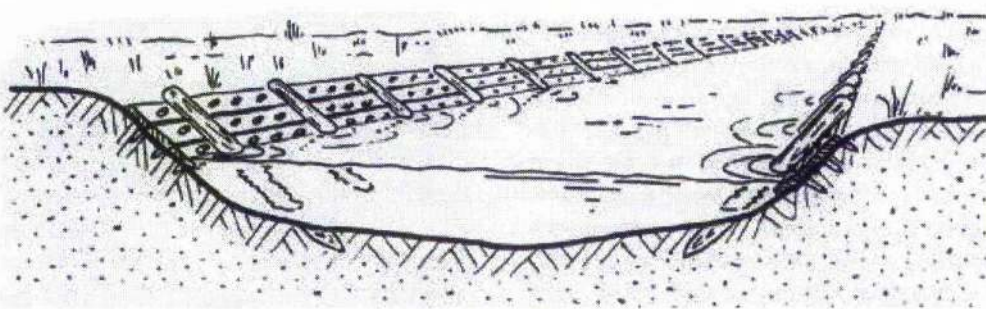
Reconstruction drawing of the Kanhave canal. Note how the planking on the inner walls prevents erosion (Nørgård Jørgensen 1995:9)
